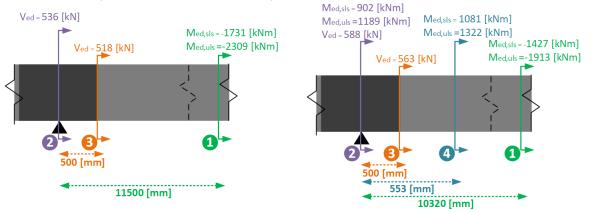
a) Design loads in statically determinate system. Figure 4.13 b) Design loads in statically indeterminate system. Figure 4.13: Design loads on critical cross-section of girders in design alternative 1b.
